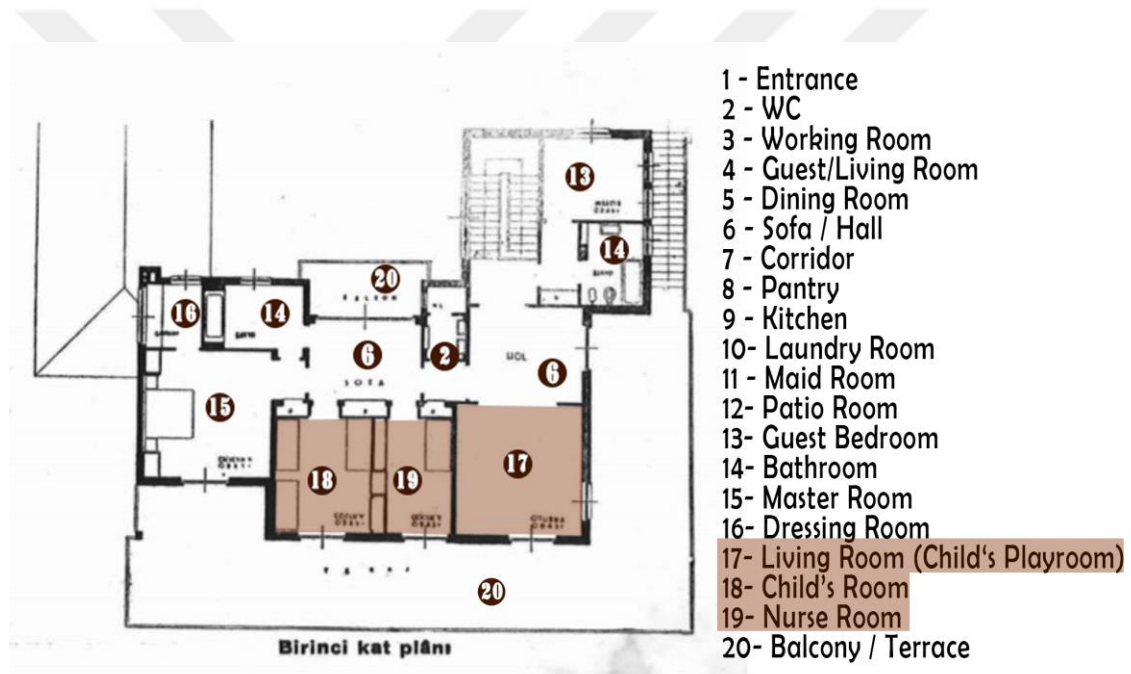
The upper floor plan of a villa in Göztepe, İstanbul (*Arkitekt, 1941-42, 7-8*)
